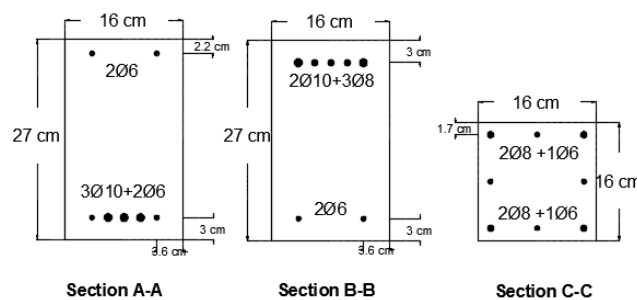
Cross-sections of columns and beams in reduced scale specimens
